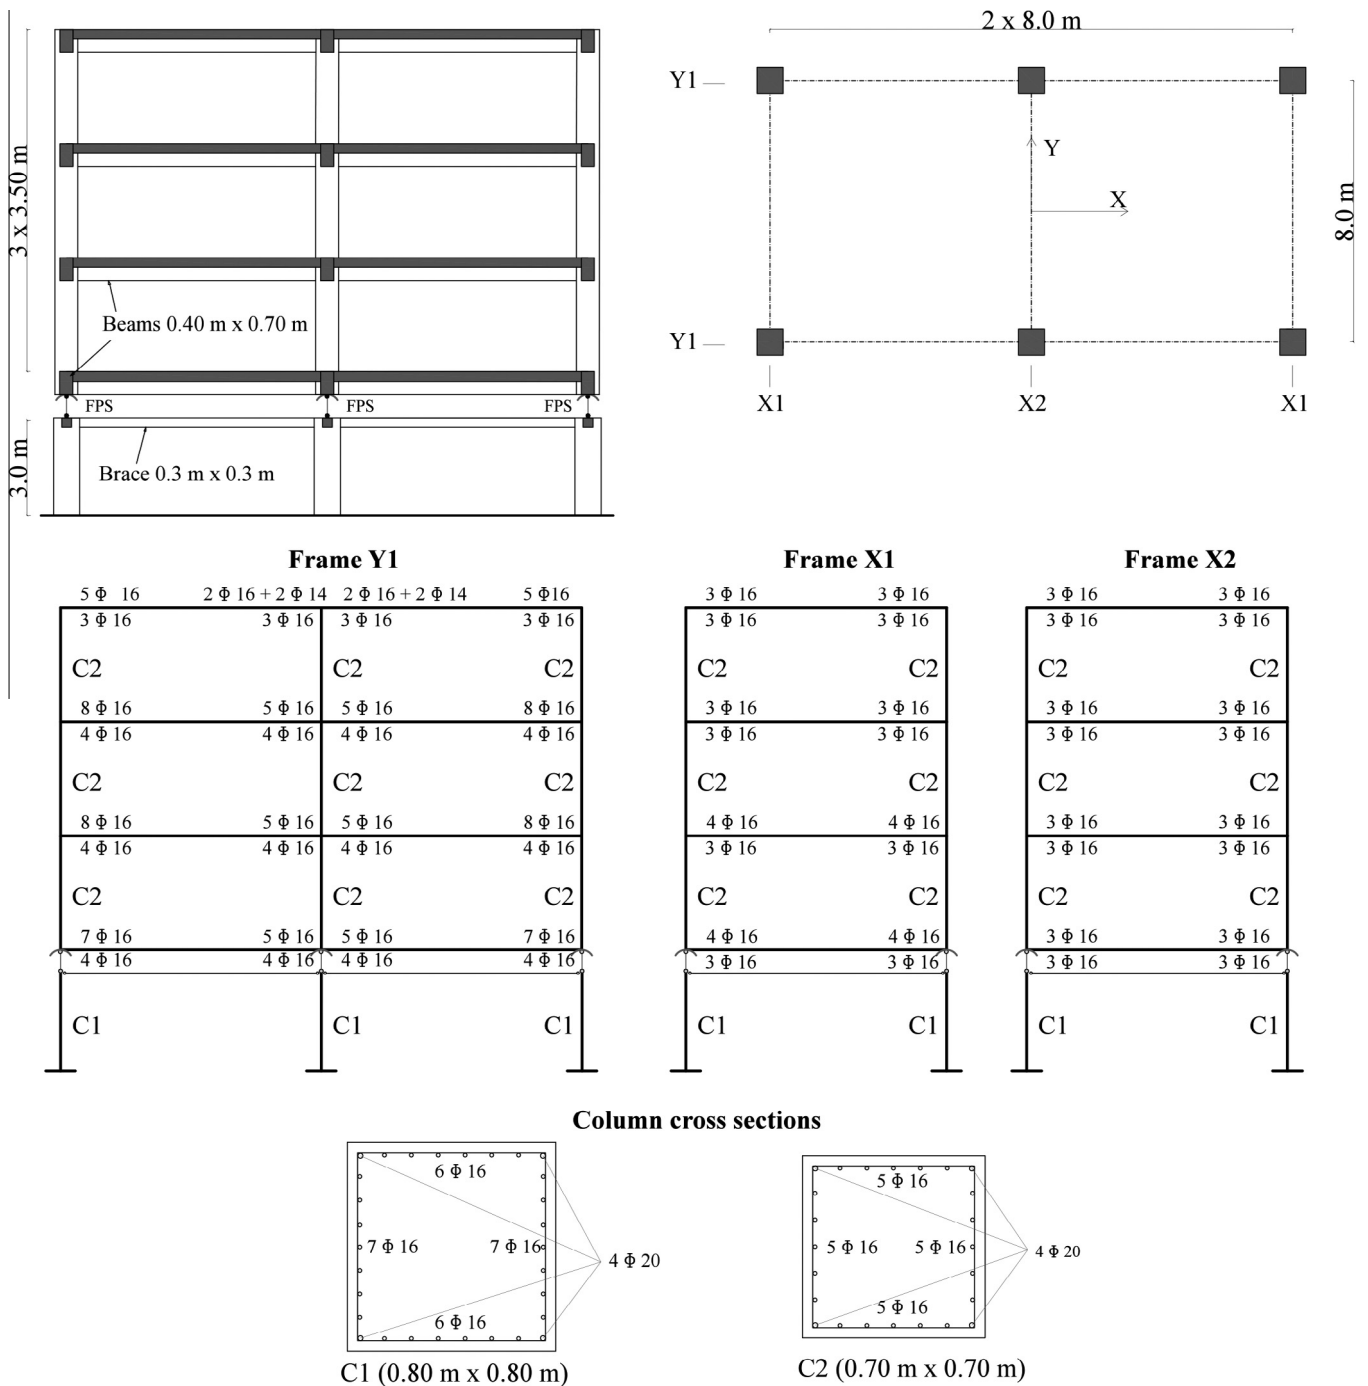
Four-story base-isolated benchmark model: front and plan views; beams reinforcement bars; columns reinforcement bars.
